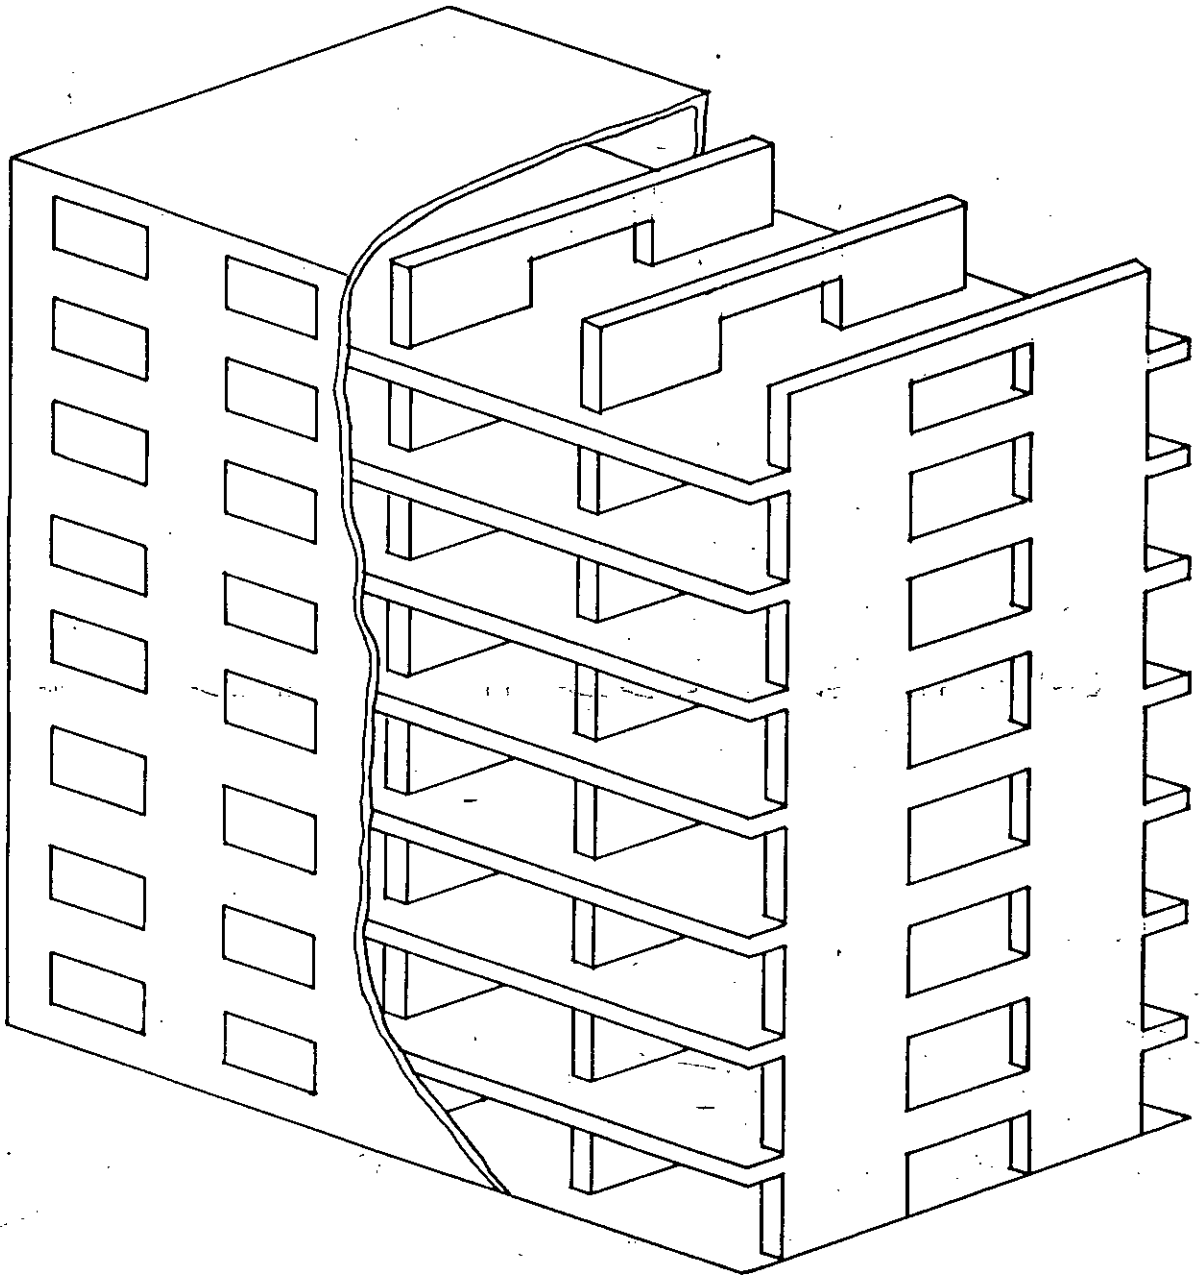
(b) Beam - Slab and Cross - Wall Building.
